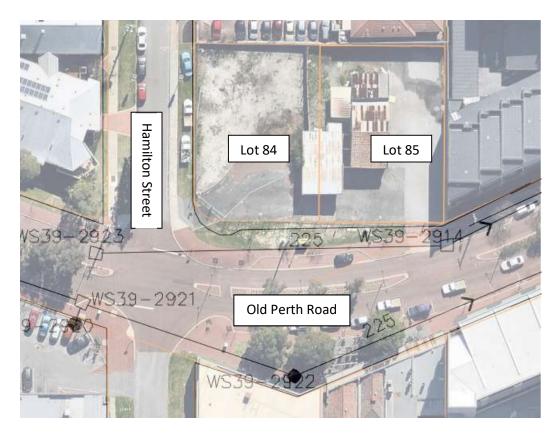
Site Aerial and Town of Bassendean stormwater drainage overlay
